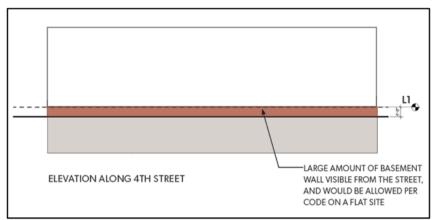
Permitted Parking Garage Ceiling Plane on a Flat Lot (Project Plans Page 46)
